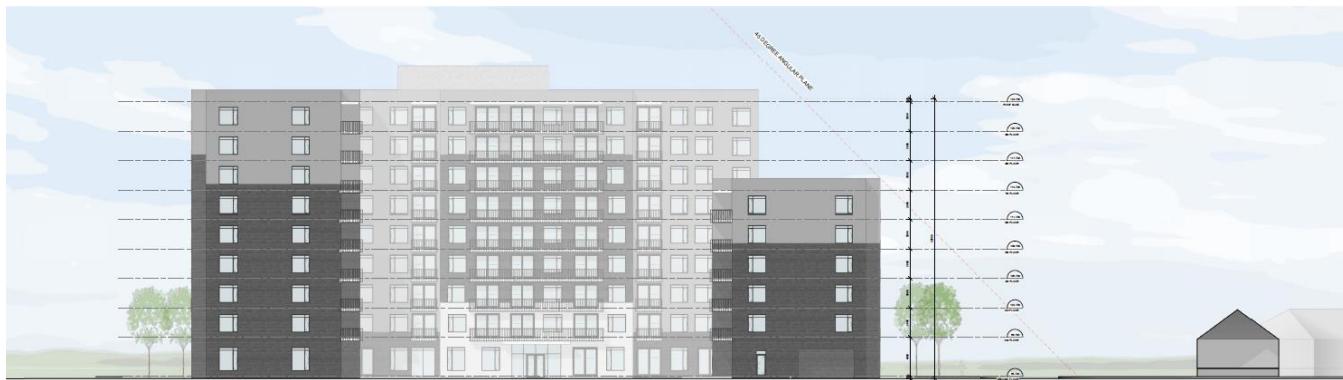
Angular Plane Section, Looking North towards Proposed Development
